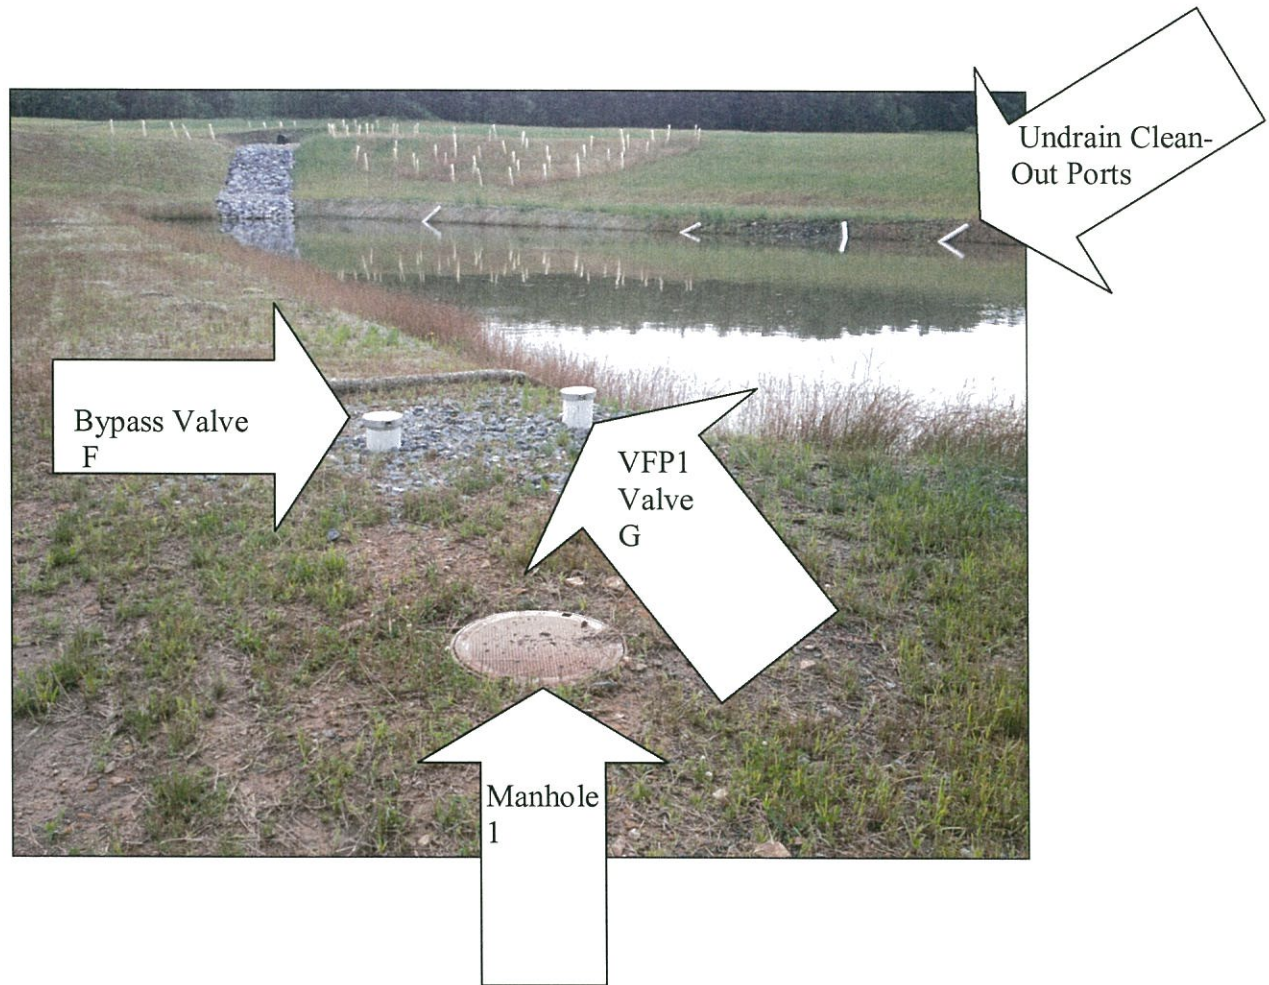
Bypass Valve and Bypass pipe Cleanout.
